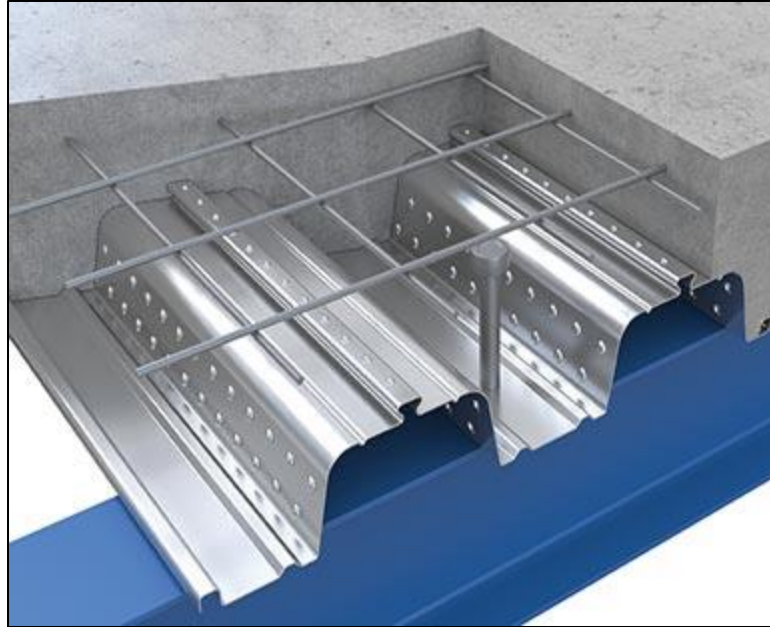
Corrugated steel stay-in-place formwork and shear stud [4]
